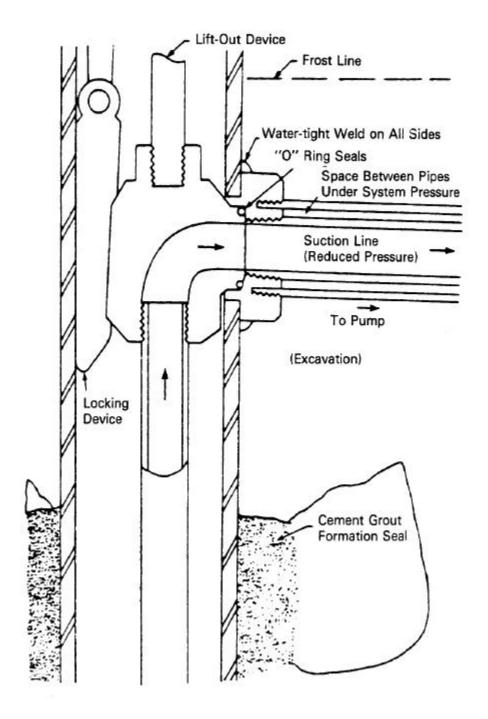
Weld-on Pitless Adapter with Concentric External Piping for "Shallow Well" Pump Installation
